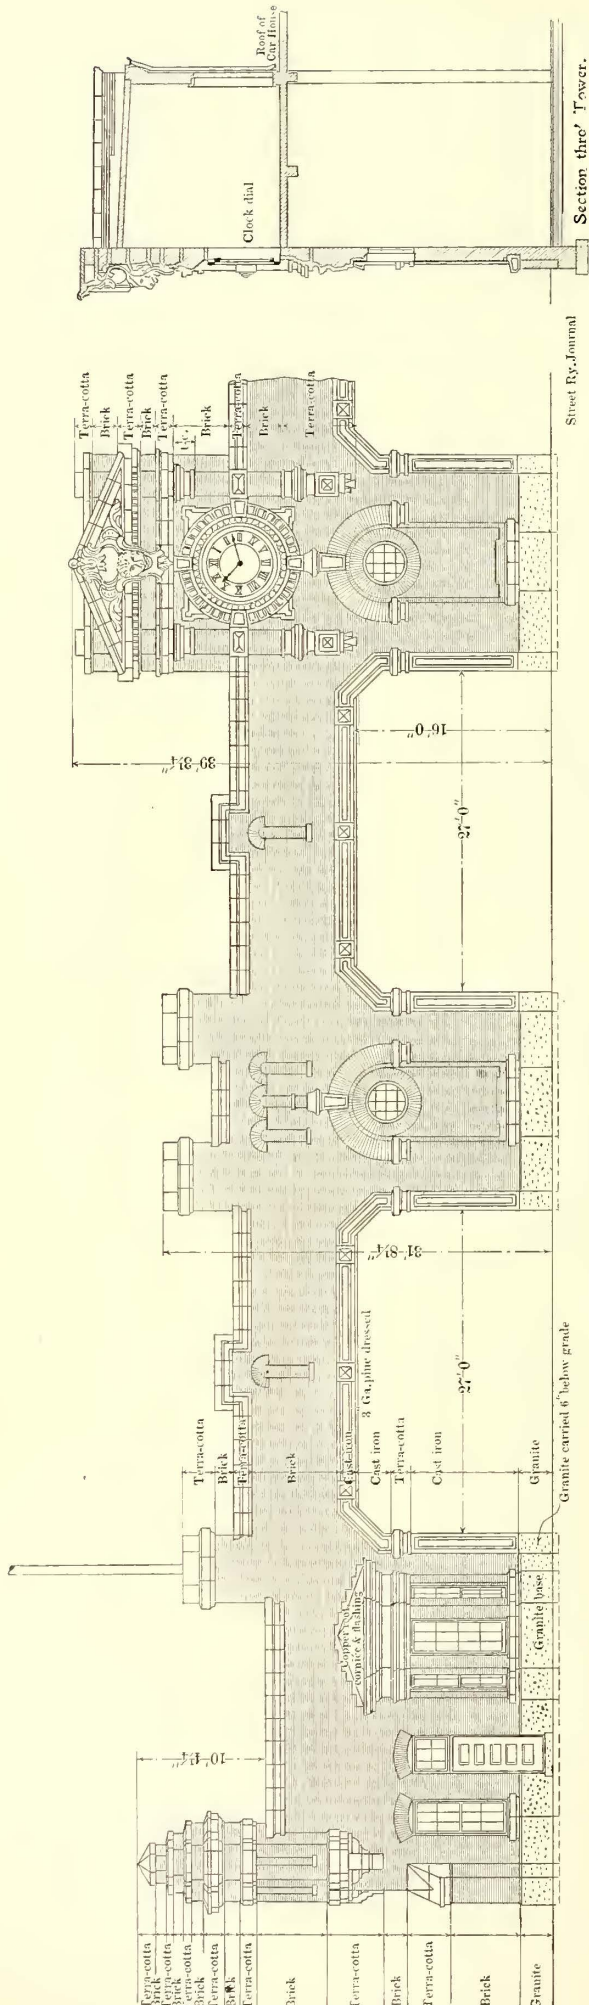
FRONT ELEVATION OF ELECTRIC PARK CAR HOUSE
